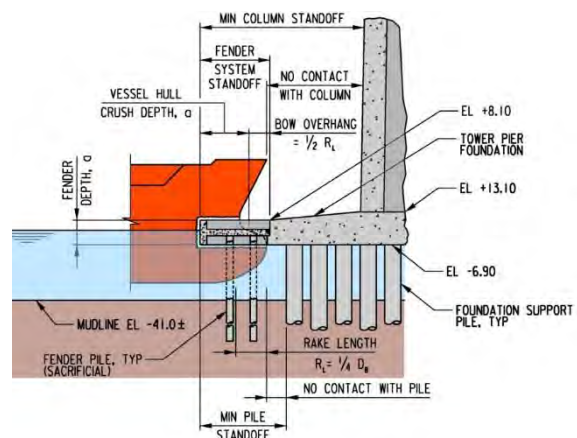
Ship Bow Crushing and Bridge Pier Geometry
